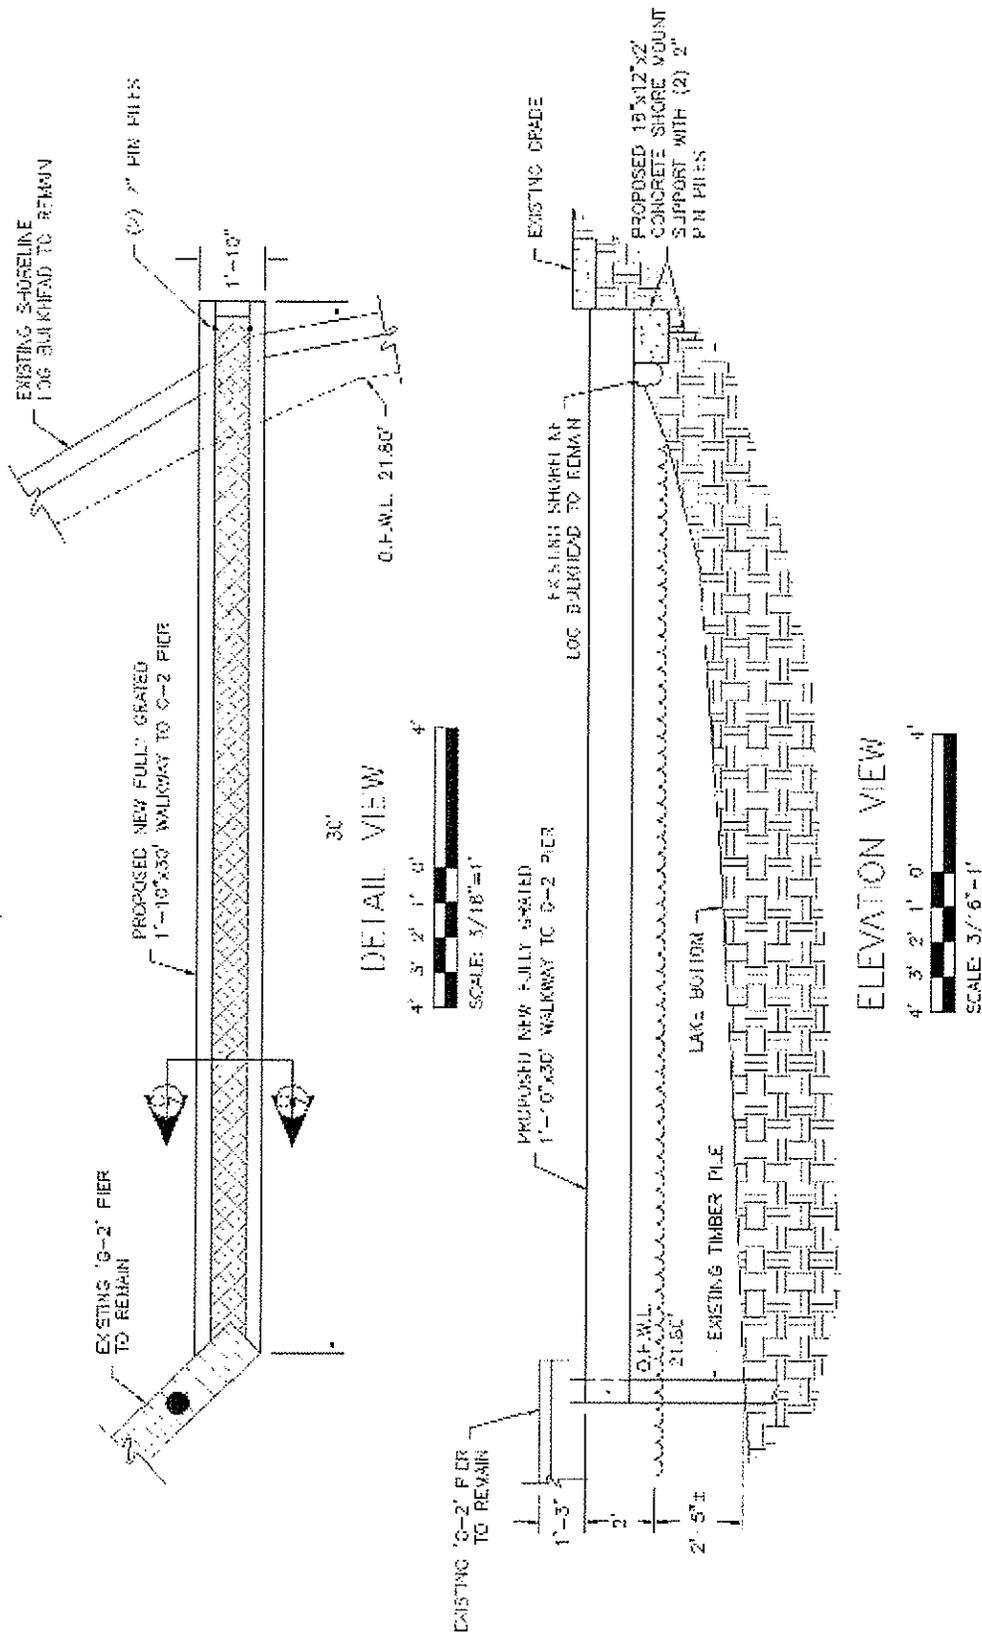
Elevation views of the existing and proposed Pier G2 area (prepared by Waterfront Construction Inc.).
